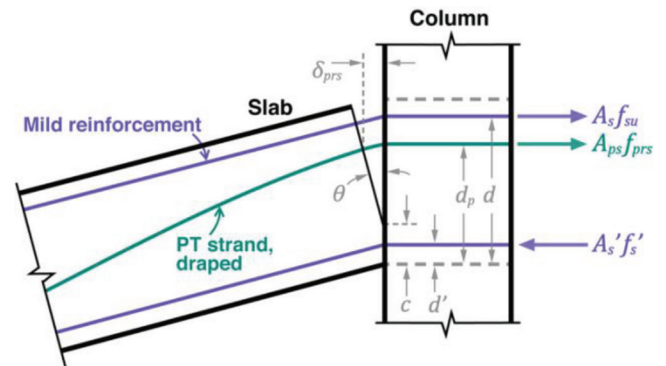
Rotation of slab-column joint elongates prestressing strand.
